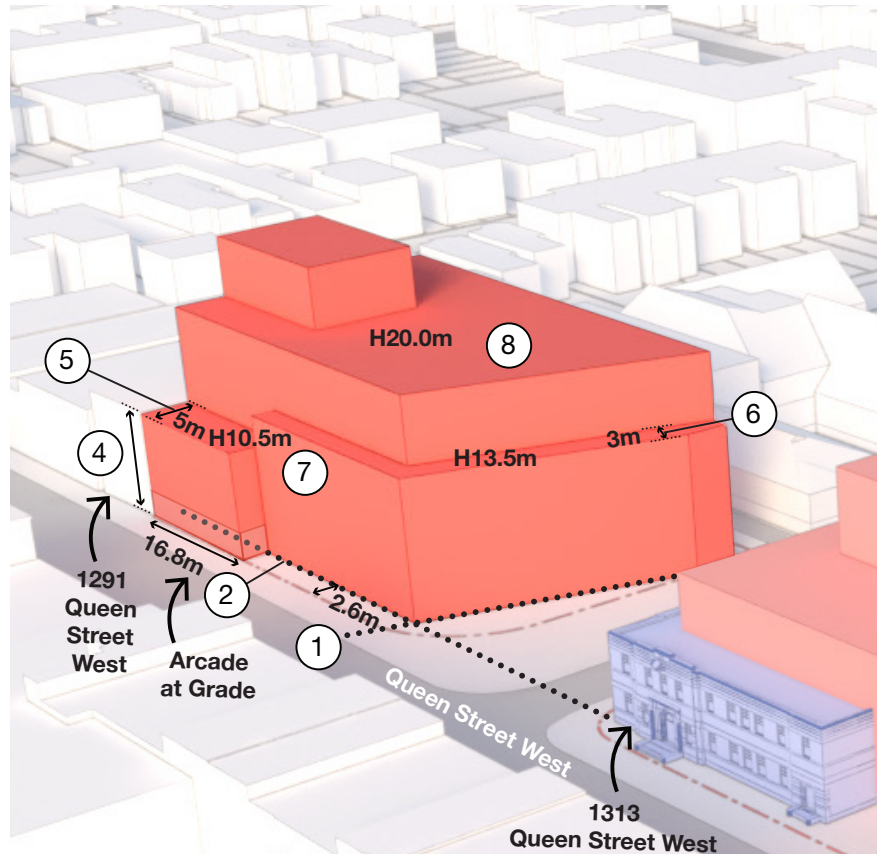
/ East Block massing model: front view (looking southeast from Queen Street West).
